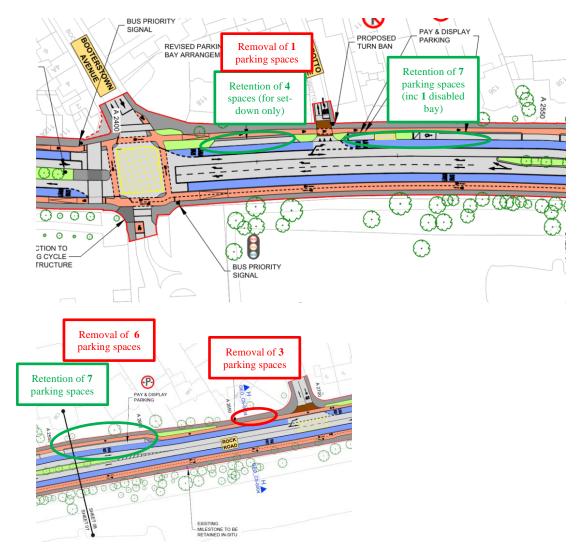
Proposed scheme design on Rock Road (at Booterstown Avenue and St Helen's Road junctions)
